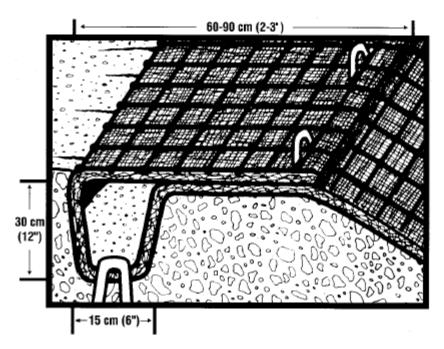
Initial Anchor Trench for Blankets/Matting
